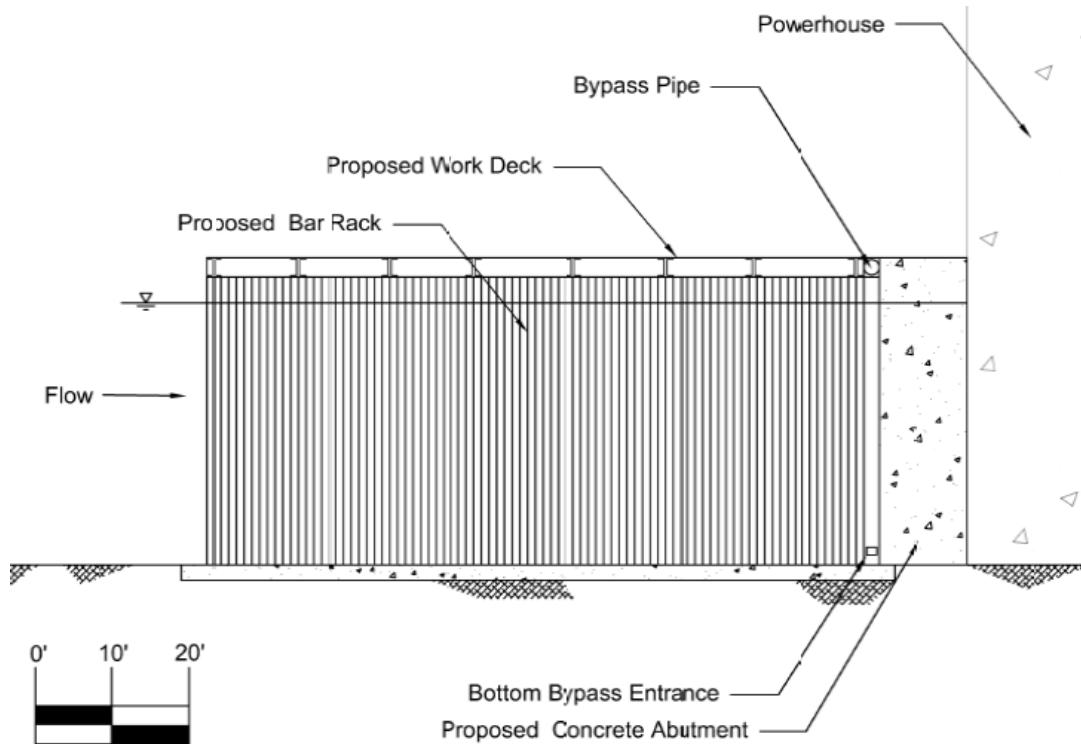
Conceptual design of an angled bar rack installed at Worumbo (section view).
